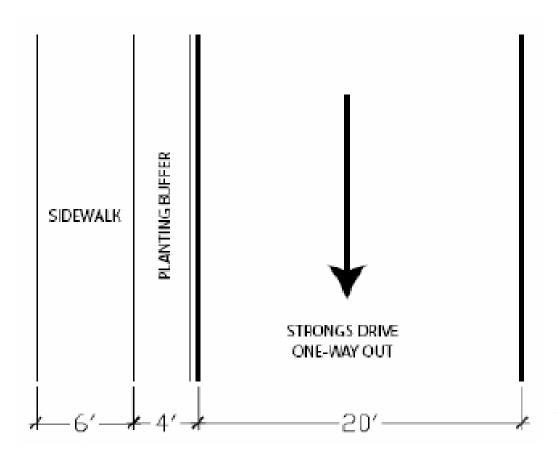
Plan view of Strongs Drive - *Alt 1
